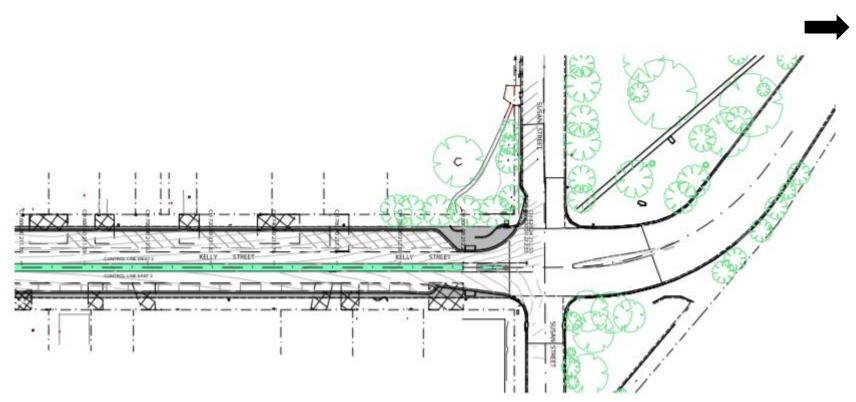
Proposed Kelly Street road realignment, median and car parking layout between St Aubins Street and Susan Street. Source: RHM Consulting Engineers, 2021
